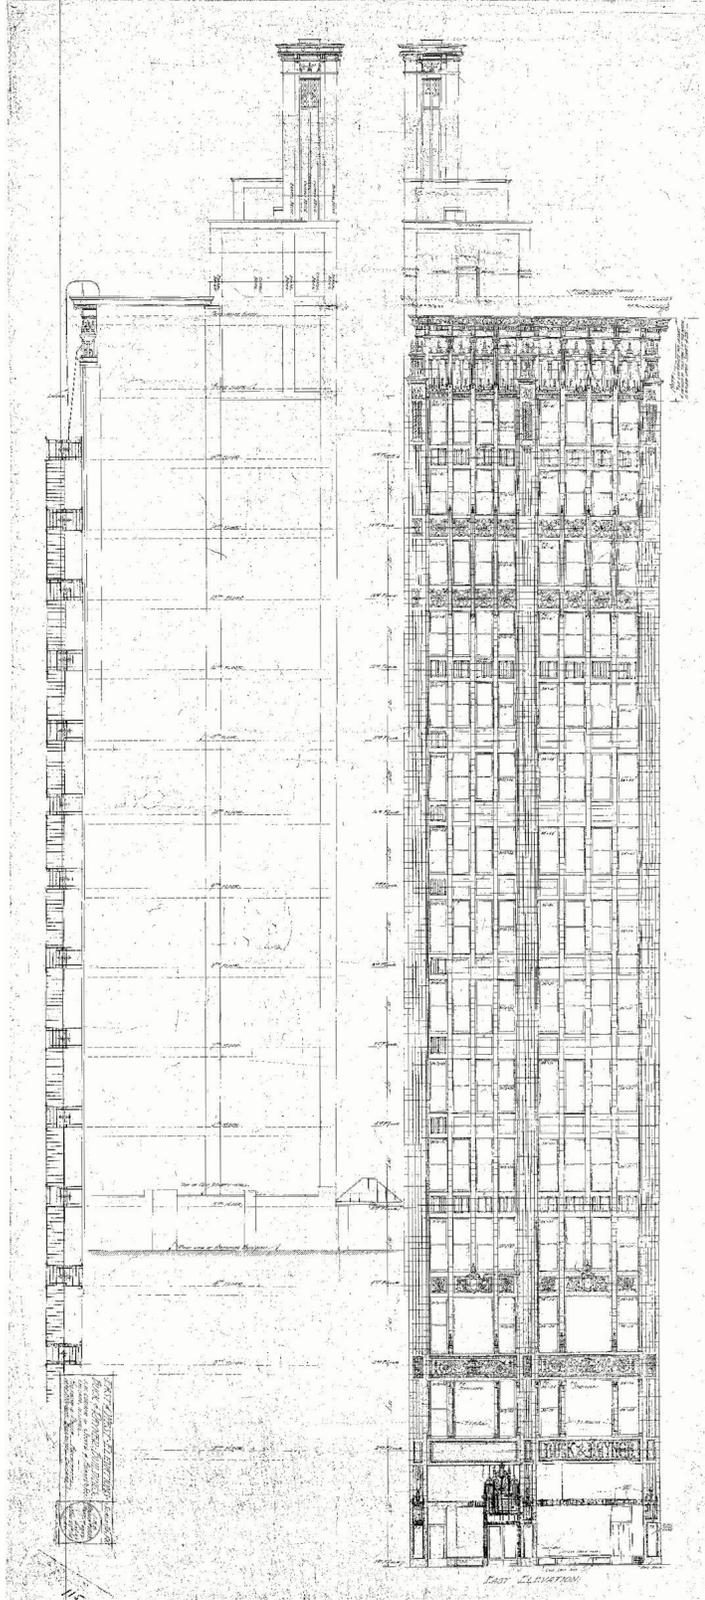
Original drawing, 202 S. State, west and east facades, 1914.
